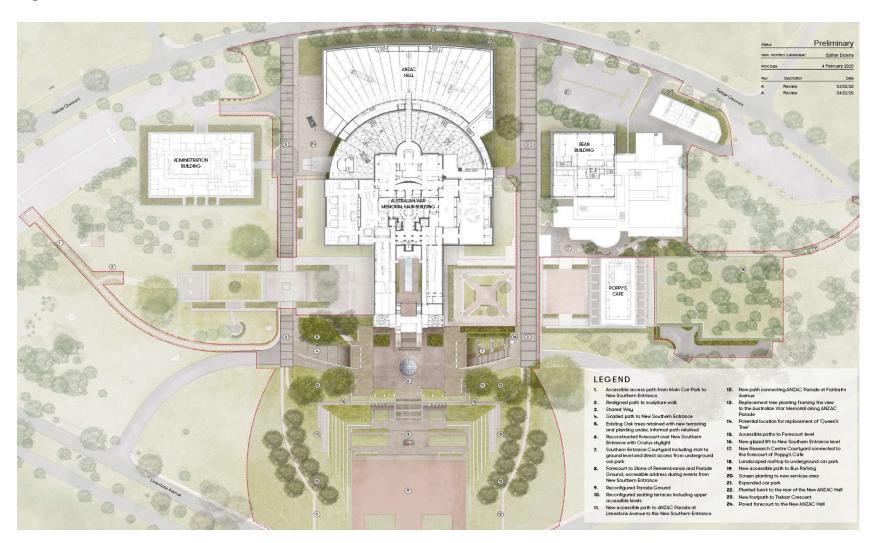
Site Plan – Anzac Hall & Glazed Link
